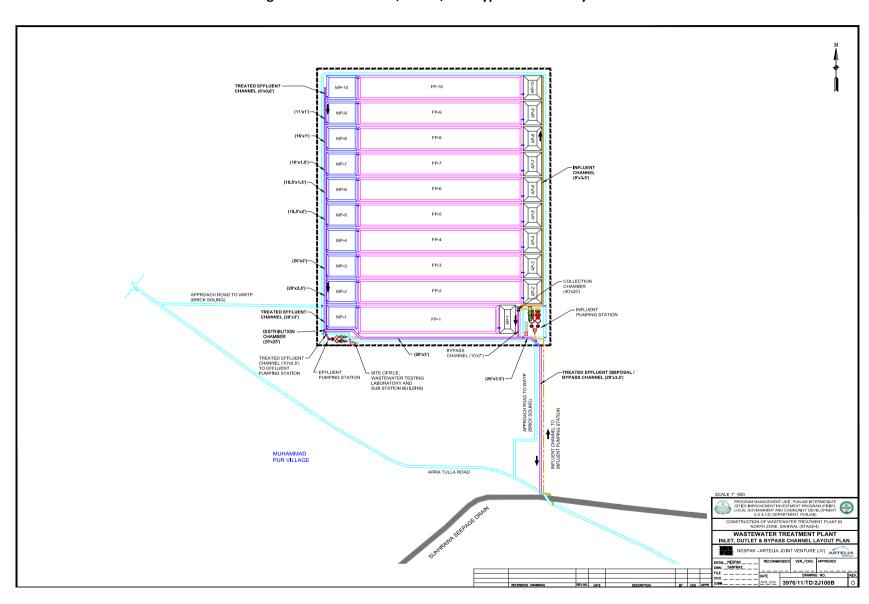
WWTP inlet, outlet, and bypass channel layout Plan
